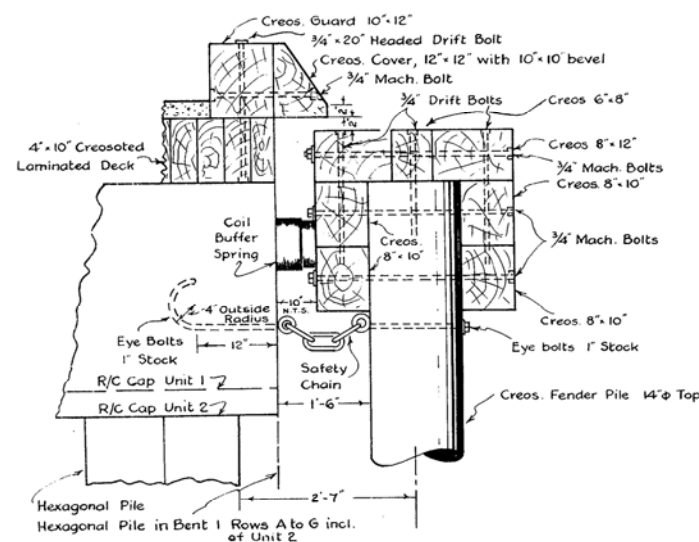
DETAIL OF FENDER PILE CAPPING
